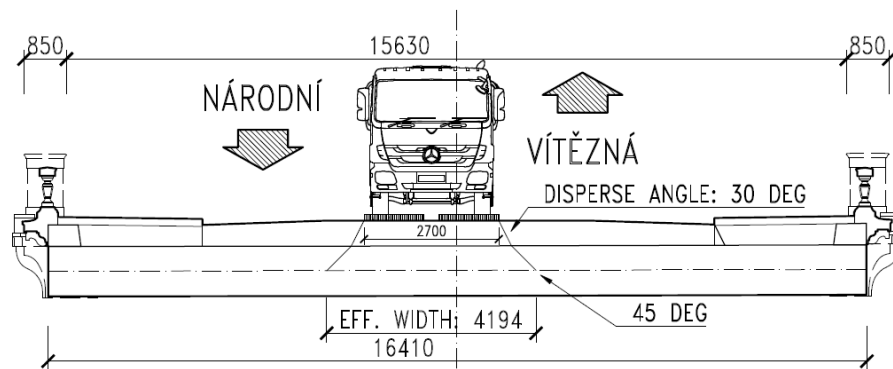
Graphical calculation of effective width is carried out on the view of cross section in the bridge midspan.
